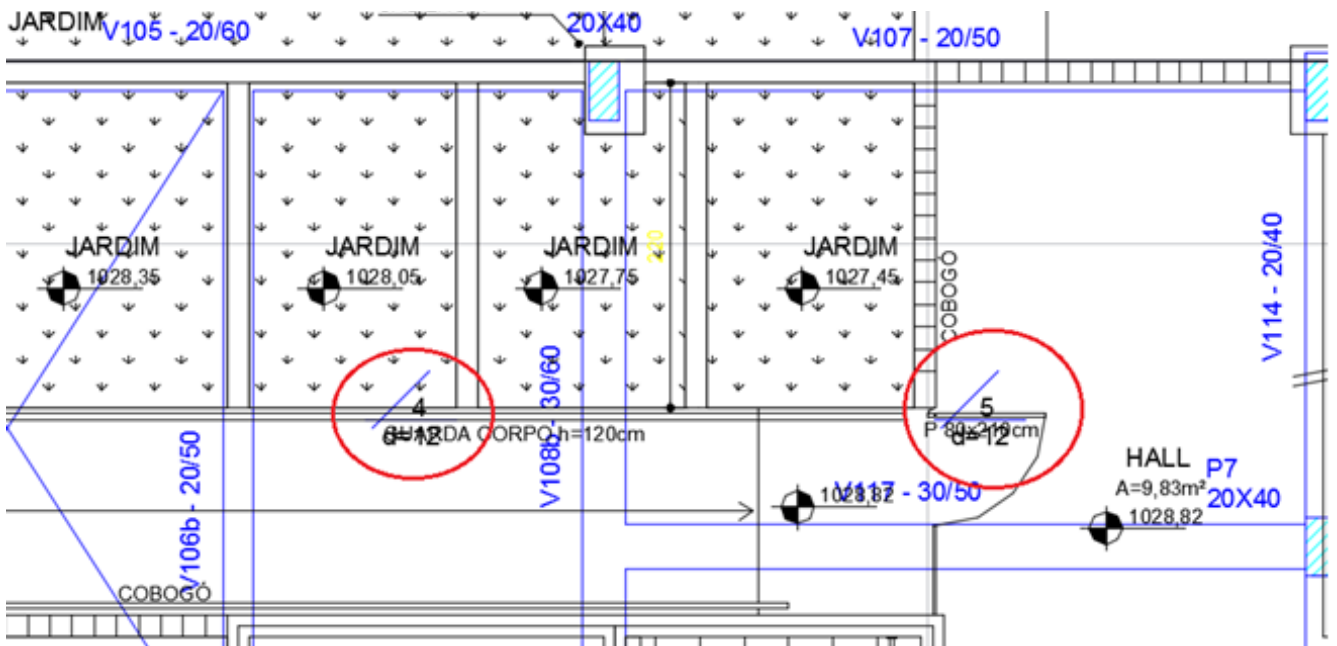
Slabs dimensioned over the permeable area / garden. Source – Construtora Collection, 2016
